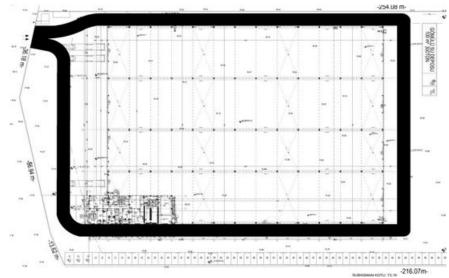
Fire Brigade Ring Line in the Layout Plane
